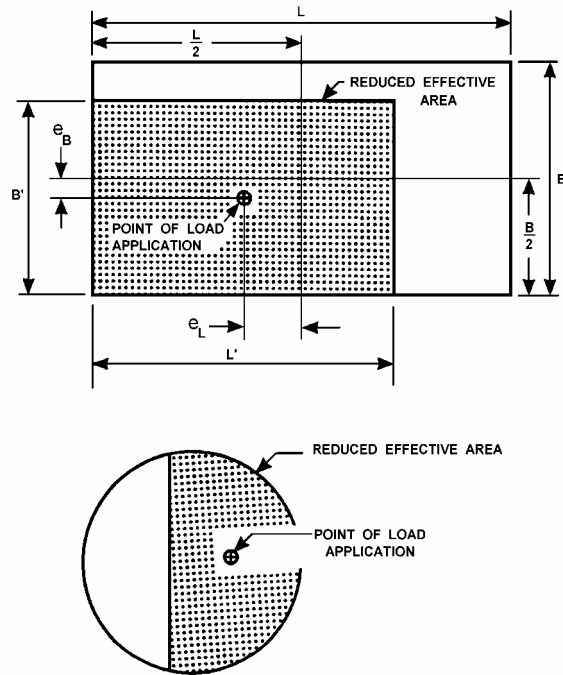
Reduced Footing Dimensions.
